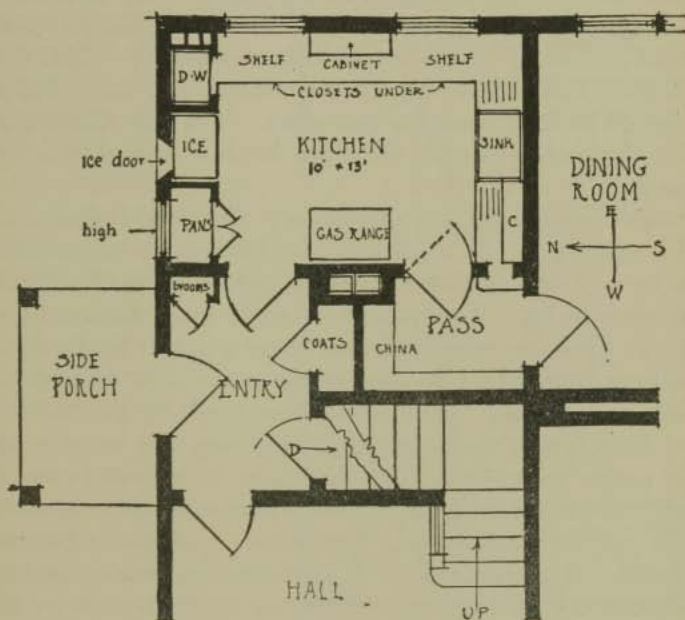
A KITCHEN FOR A SUBURBAN HOUSE
